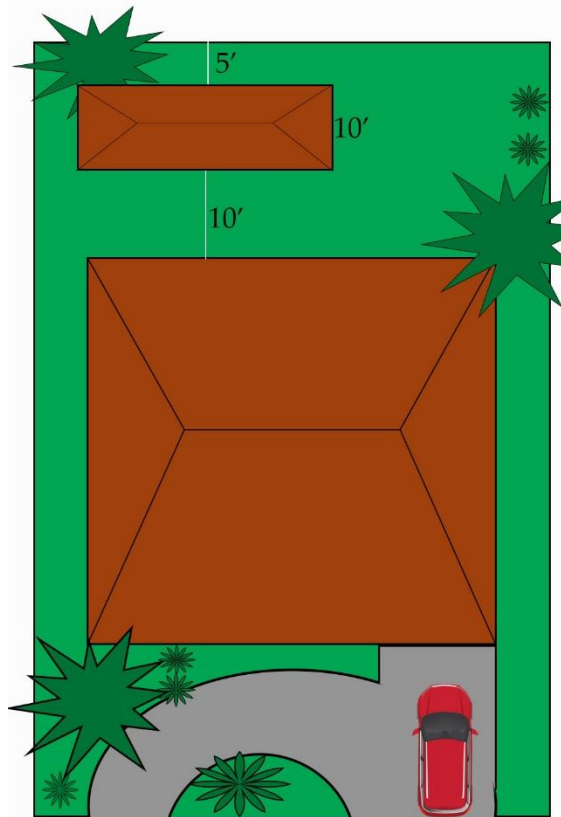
10'x30' Detached canopy configuration on 60-foot lot.
